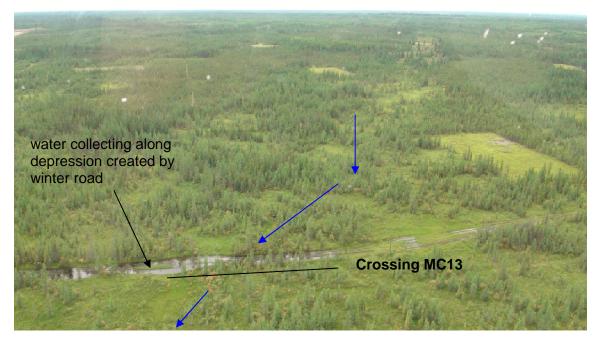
Drainage 13 looking west at proposed crossing site MC13
